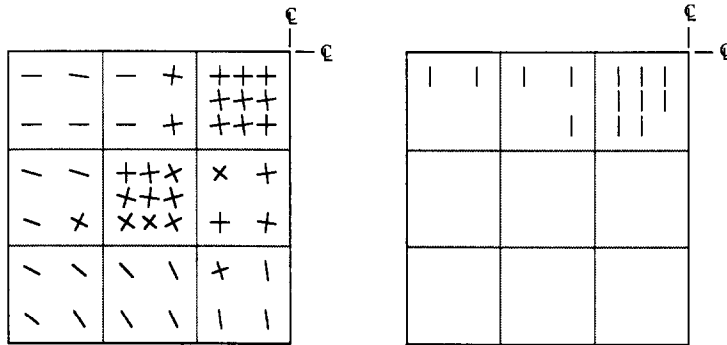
Crack pattern and yielded reinforcement for slab S11.
